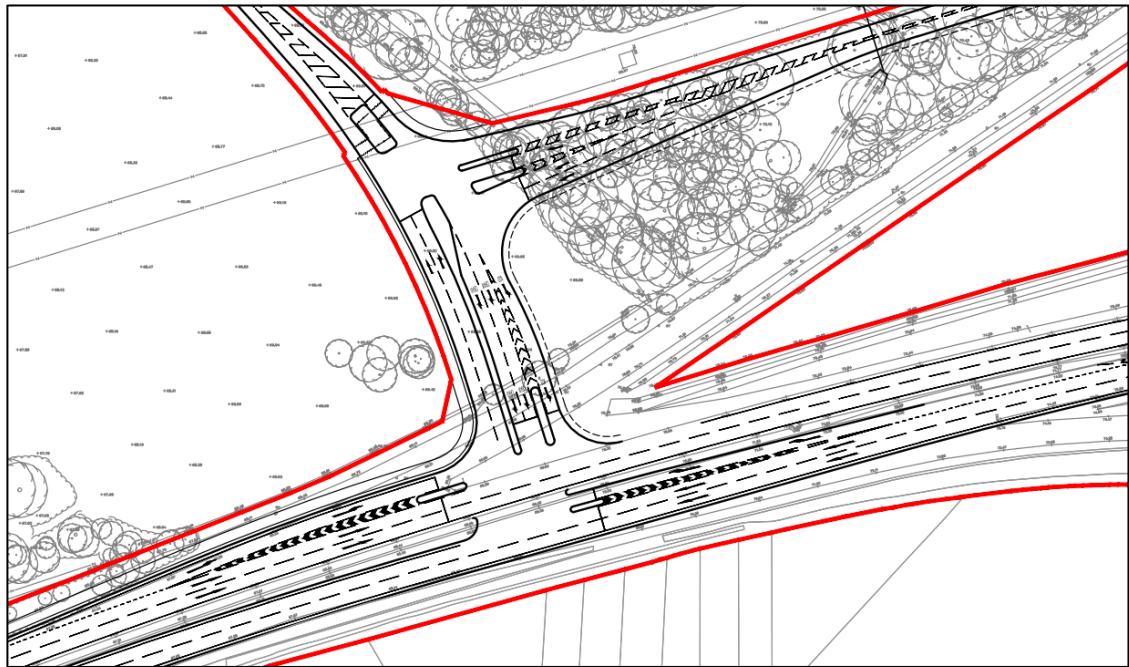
Planning Stage Plan for A2011 Signal Junction
